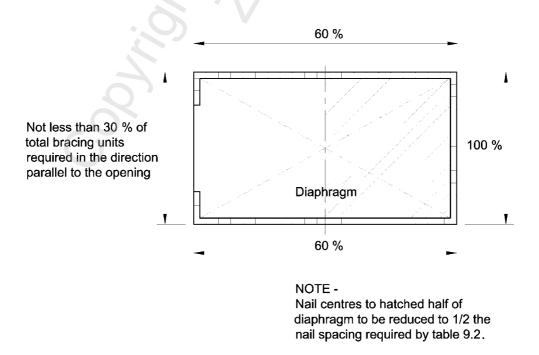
One wall containing 30 % of total bracing units (see 8.8.4)
